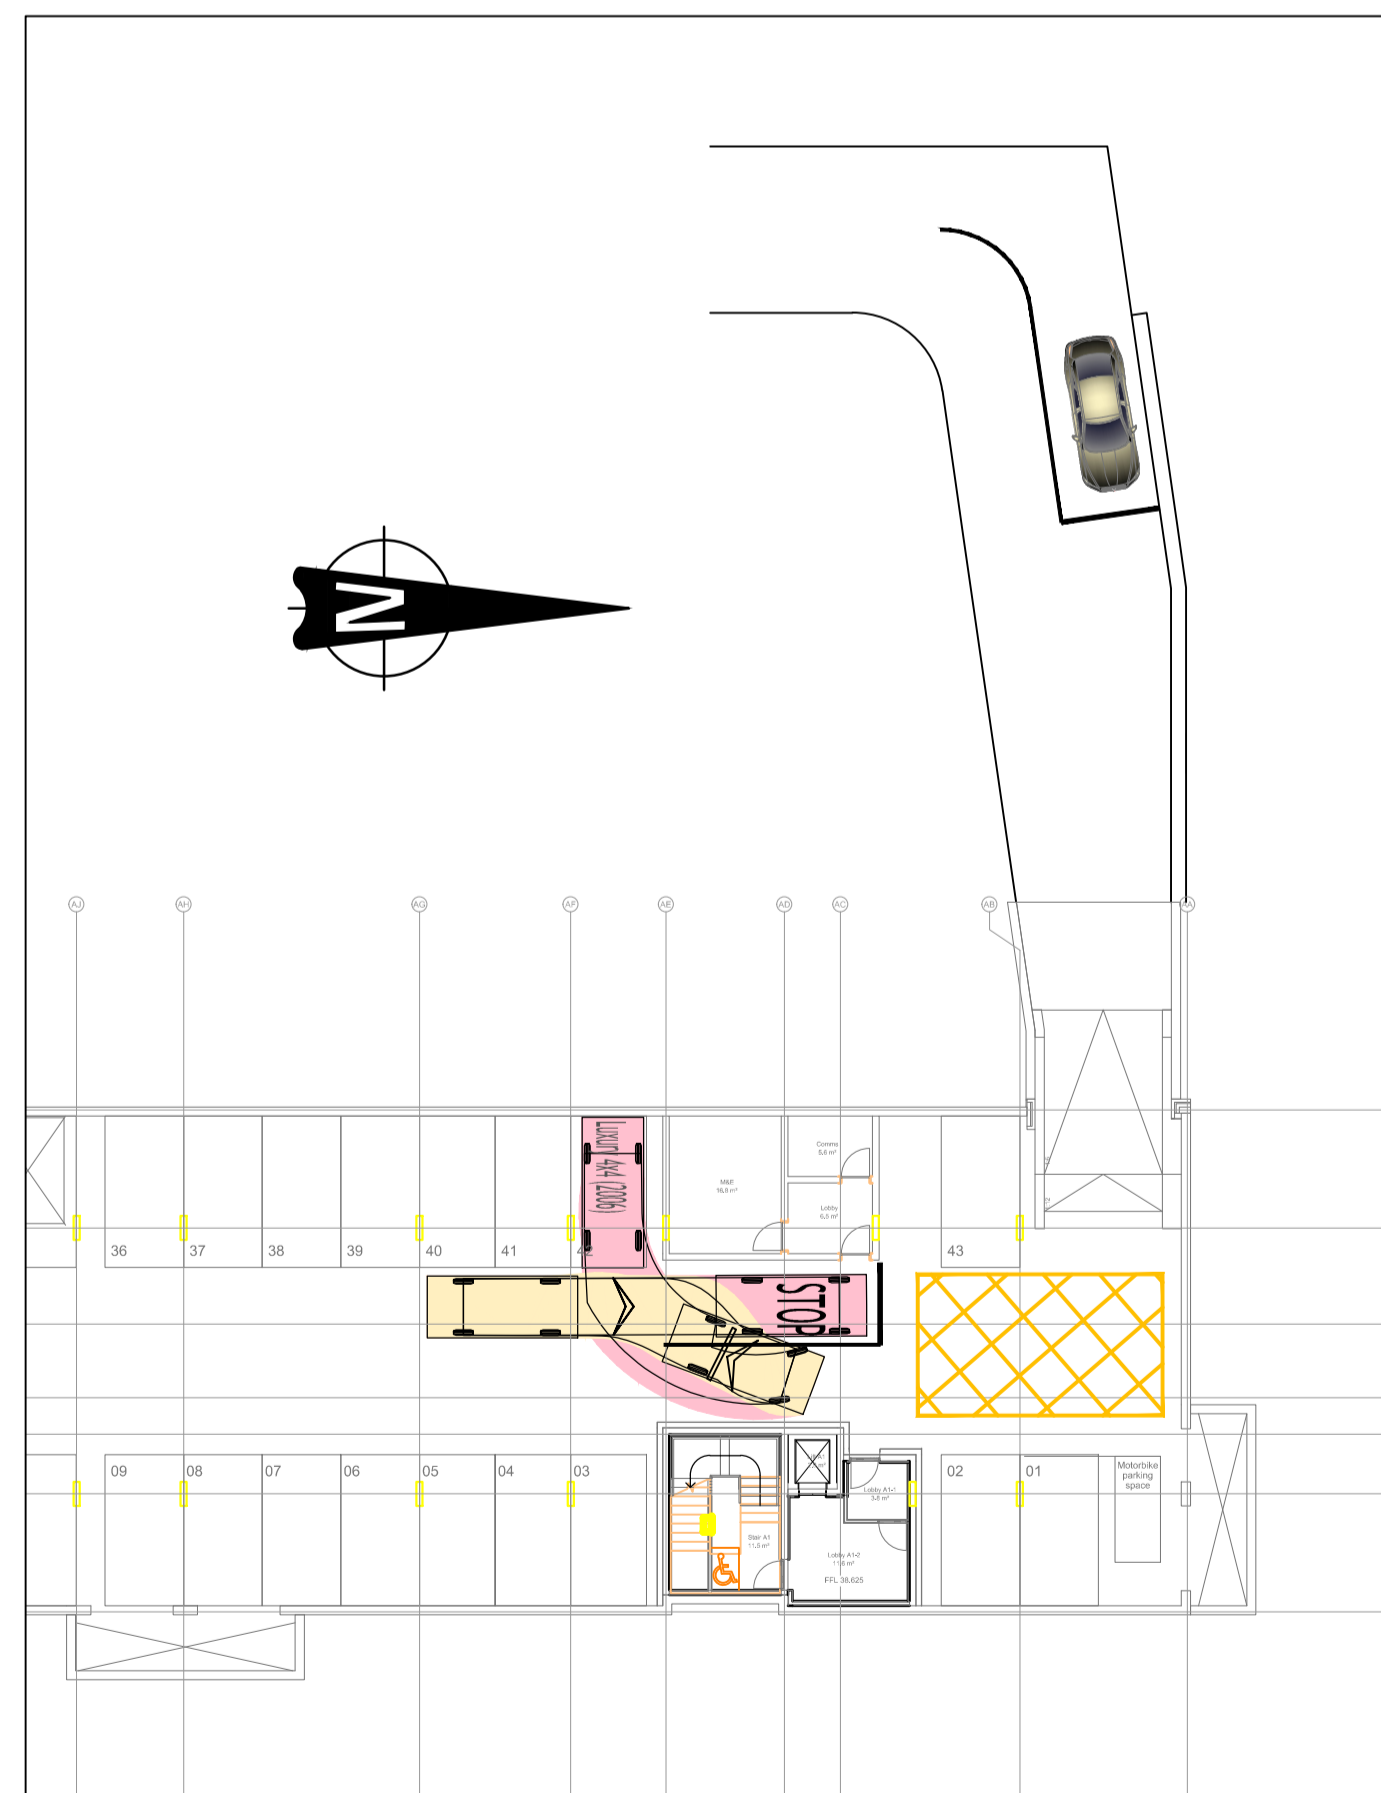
PRIVATE CAR PARKING IN BAY 42
